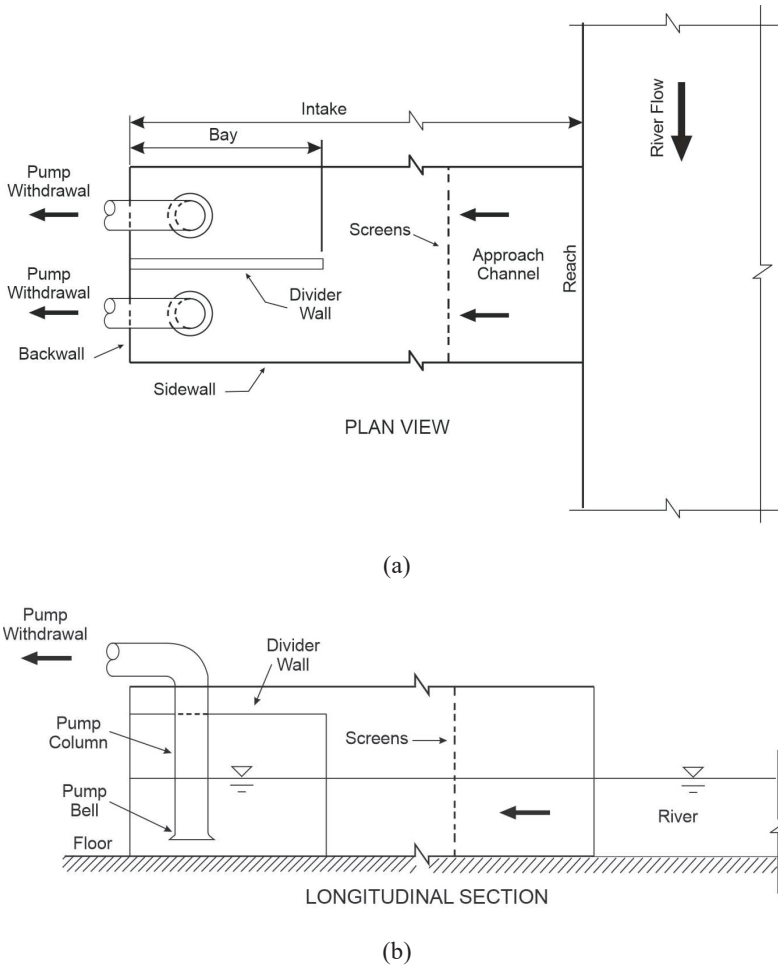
| General features of a pump intake: (a) plan view; and (b) longitudinal section.
